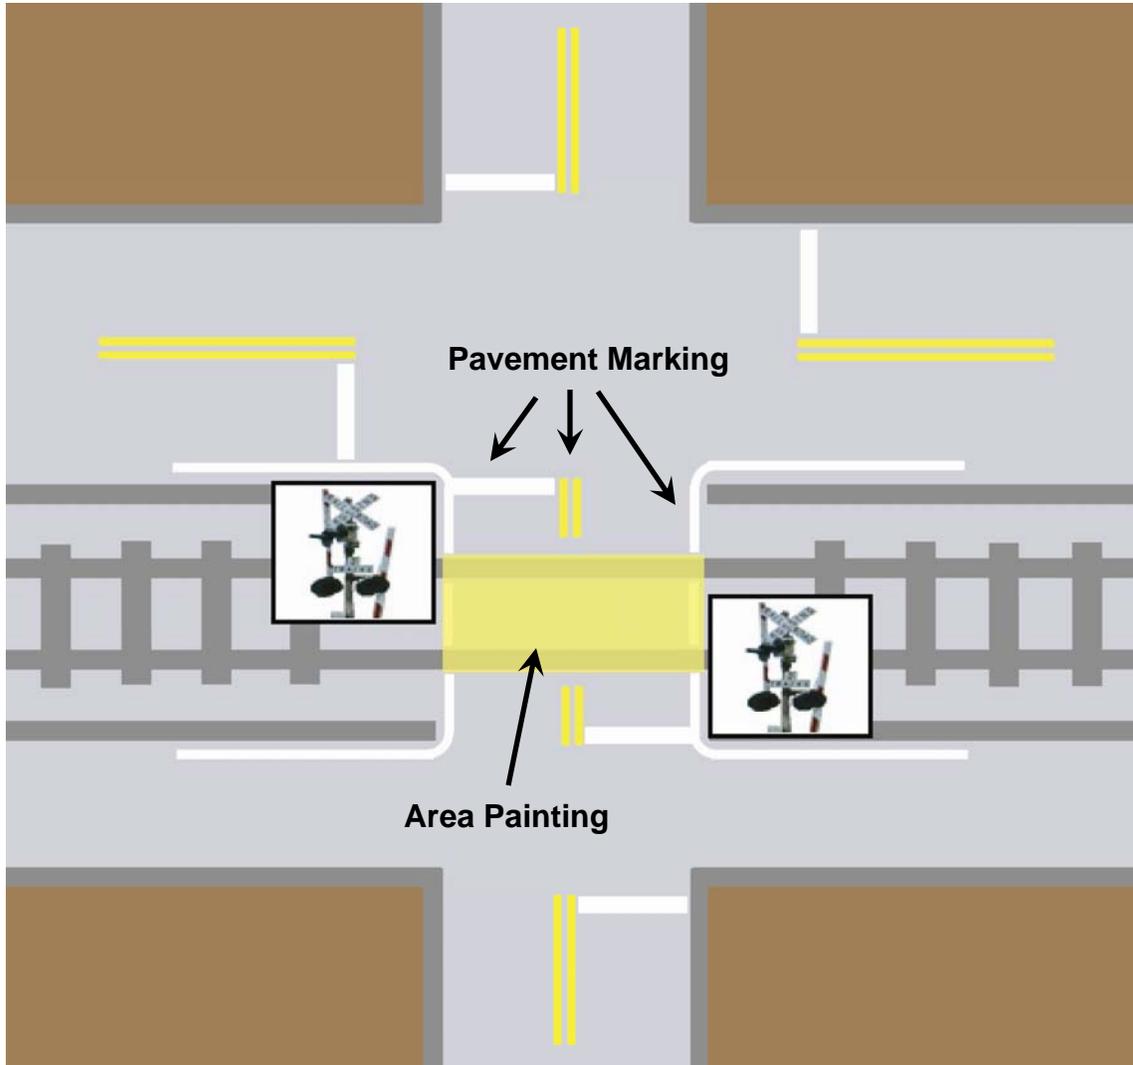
Plan view of treatments (area painting and pavement marking) at the Clinton Place grade crossing.
